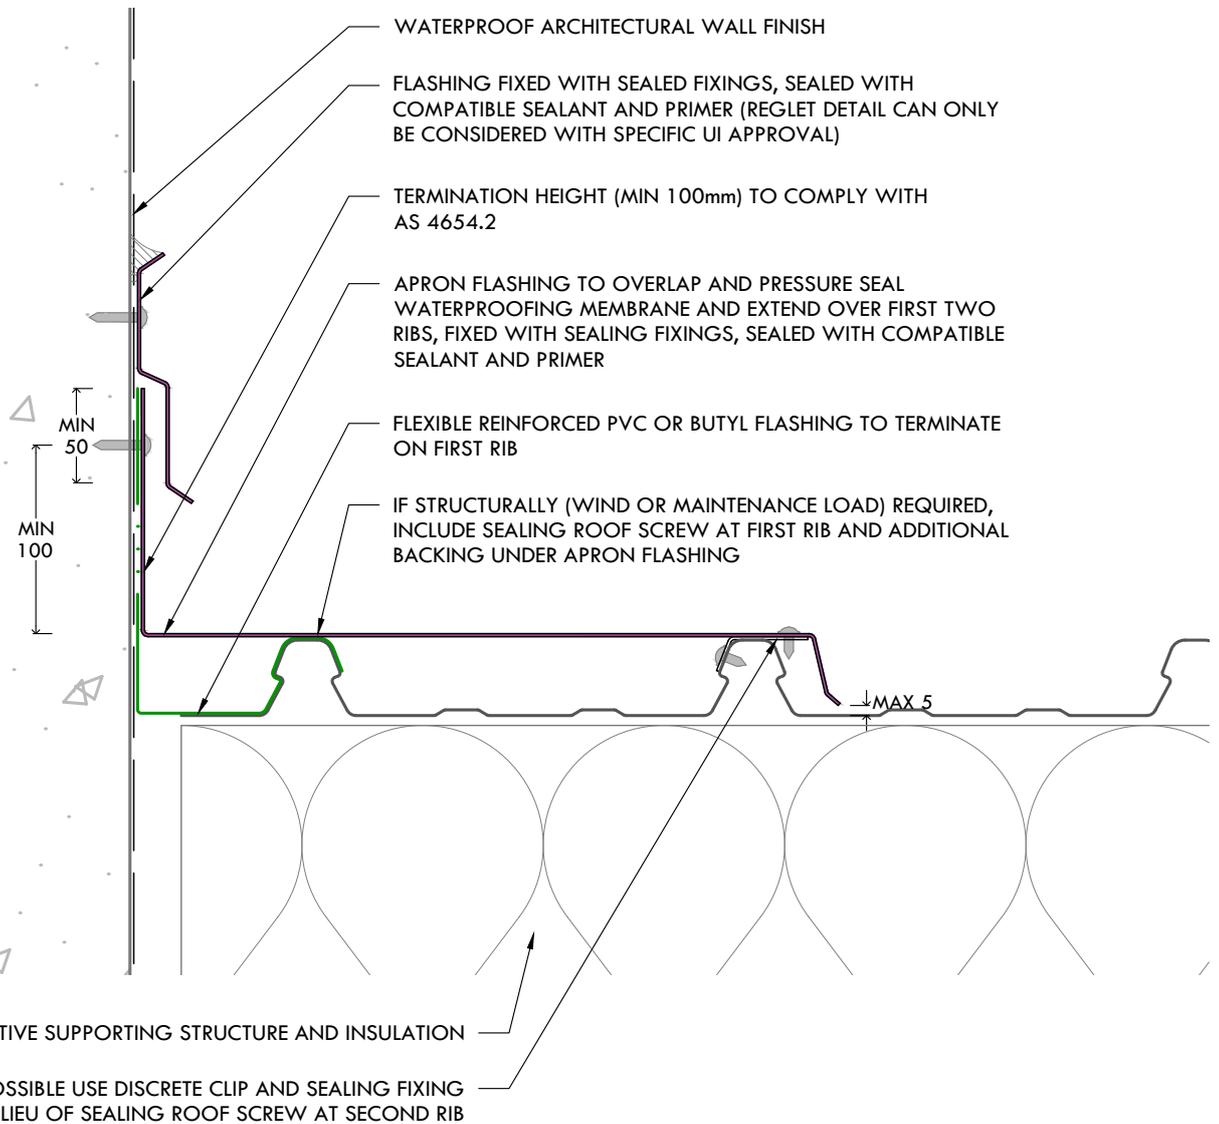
METAL ROOF TERMINATION AT VERTICAL WALL
